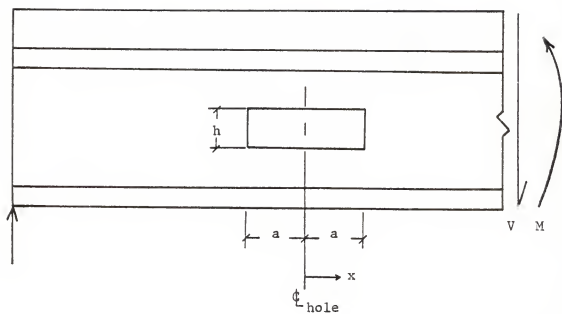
Elevation of a Steel-Concrete Composite Beam With Web Opening
